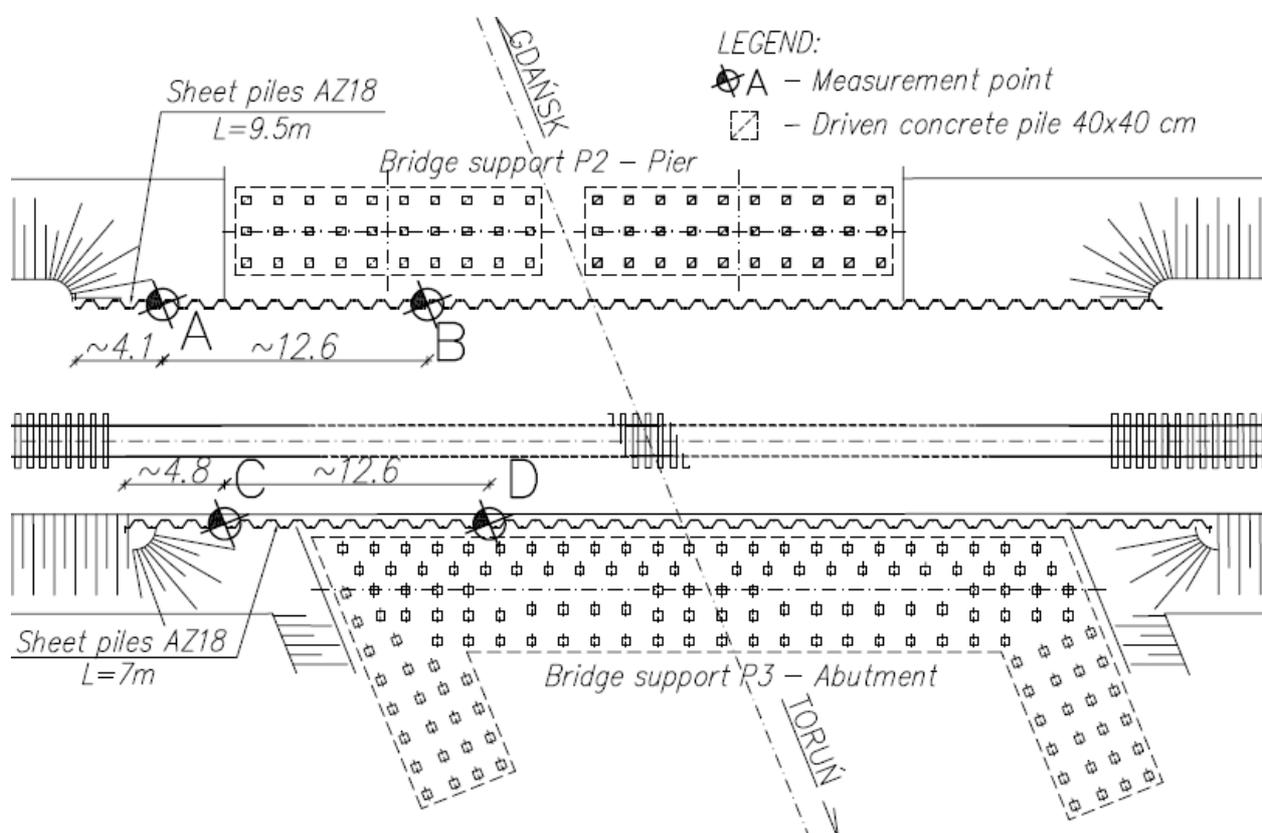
Layout of the retained rail-trunk-line and the designed viaduct foundations
